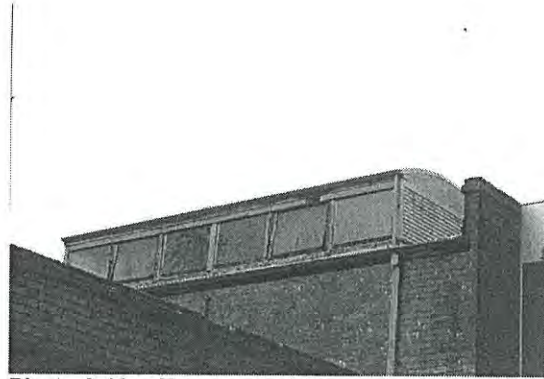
Exterior, Call Room, south elevation showing deteriorated framing and cladding of lantern light.
